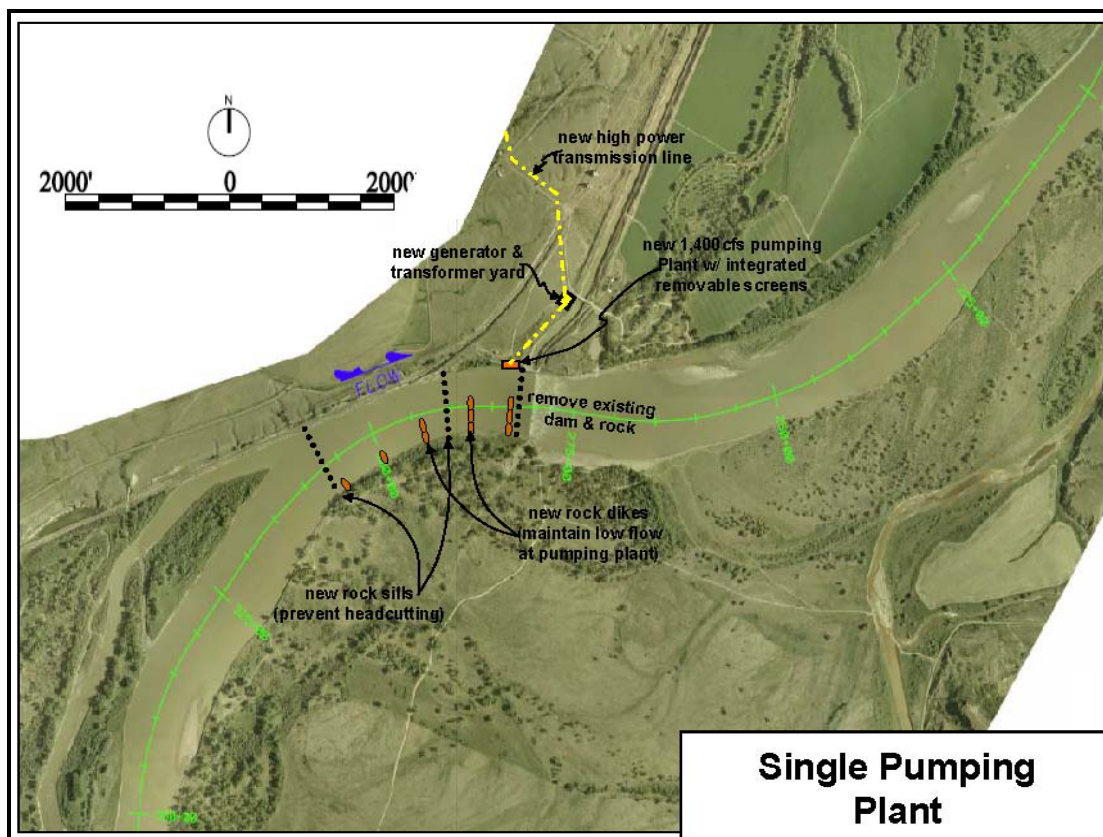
Single Pumping Plant Alternative Original Concept.
